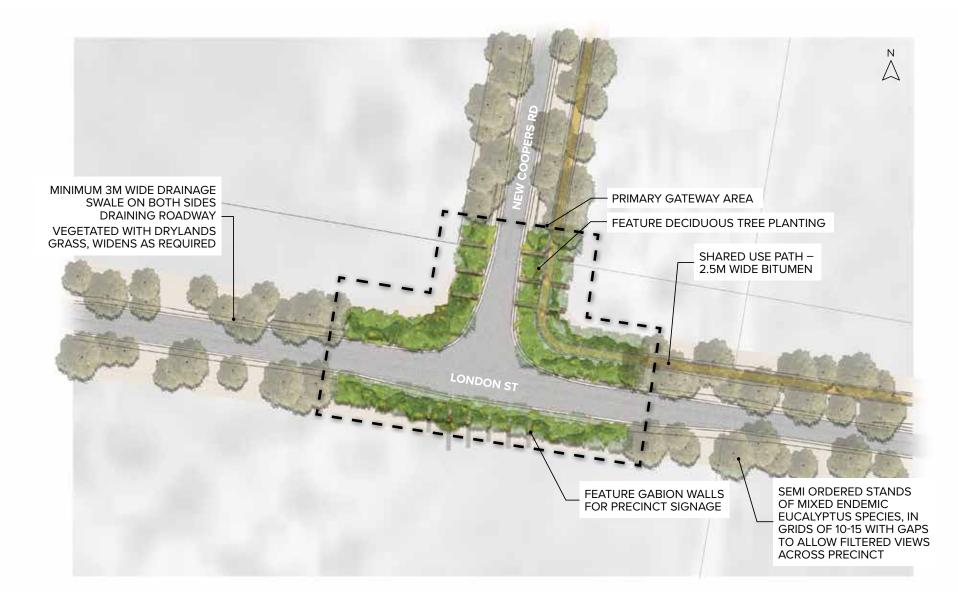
SECONDARY GATEWAY - T-JUNCTION (CONCEPT PLAN, NOT TO SCALE)
